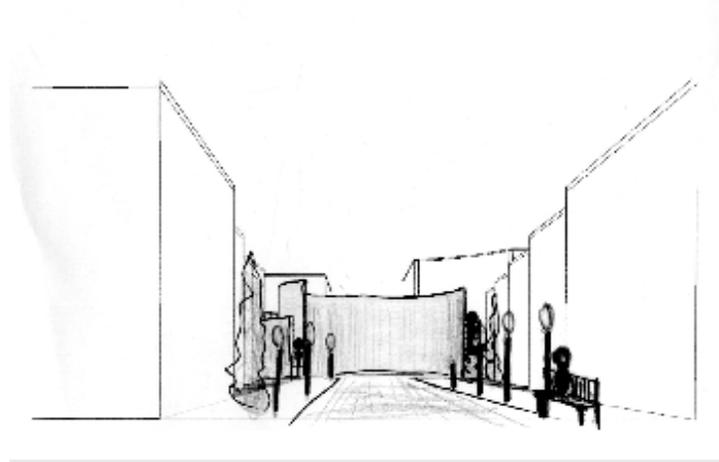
Architectural Drawings and Renderings for Proposed Koons Site Development
